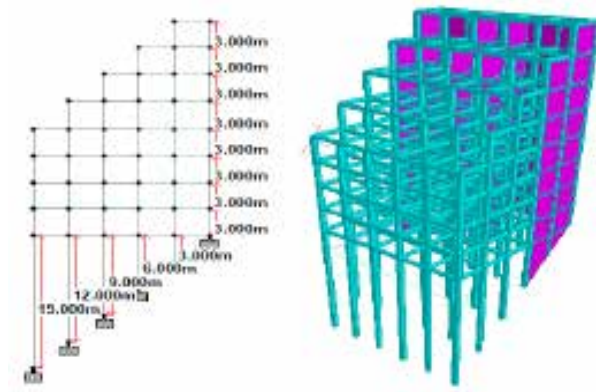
Elevation of T-Shape Shear Wall with 45° Slope
